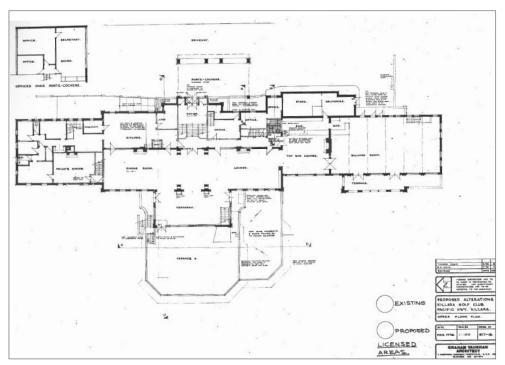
First floor plan for Lower Lounge extensions and other works, 1996, by Graham Vaughan.
